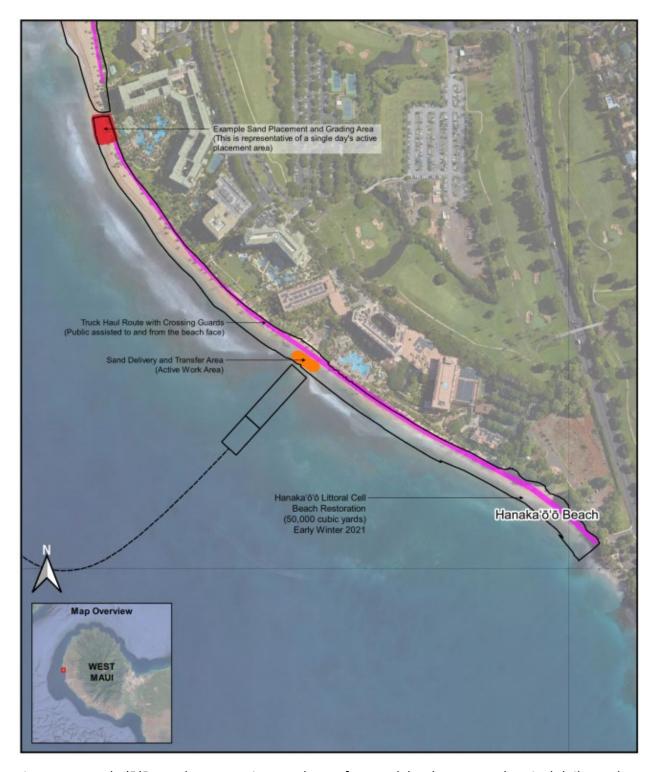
Hanaka'ō'ō Beach Restoration sand transfer, truck haul route, and typical daily work area.
